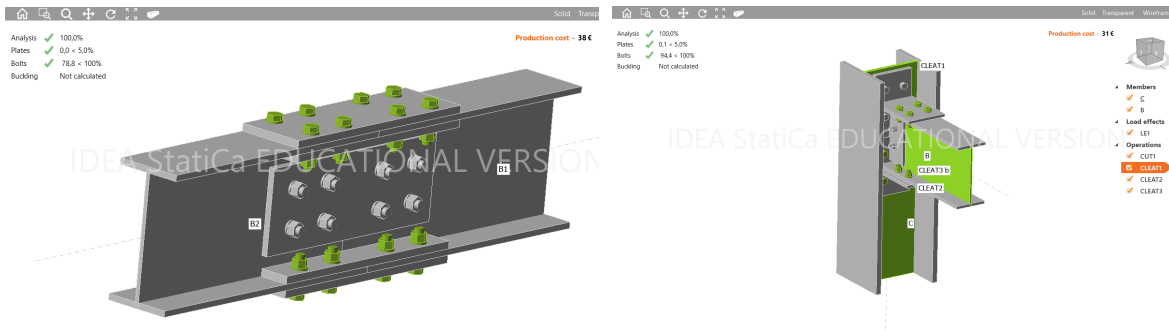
Connections of Corten steel structure of pedestrian bridge (thesis)
